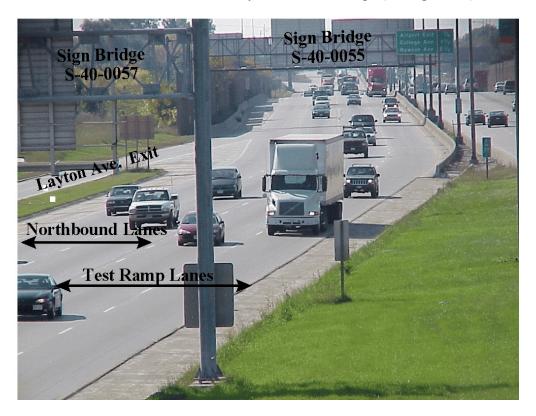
View of I-94 Northbound from Layton Avenue Bridge (Facing North).
